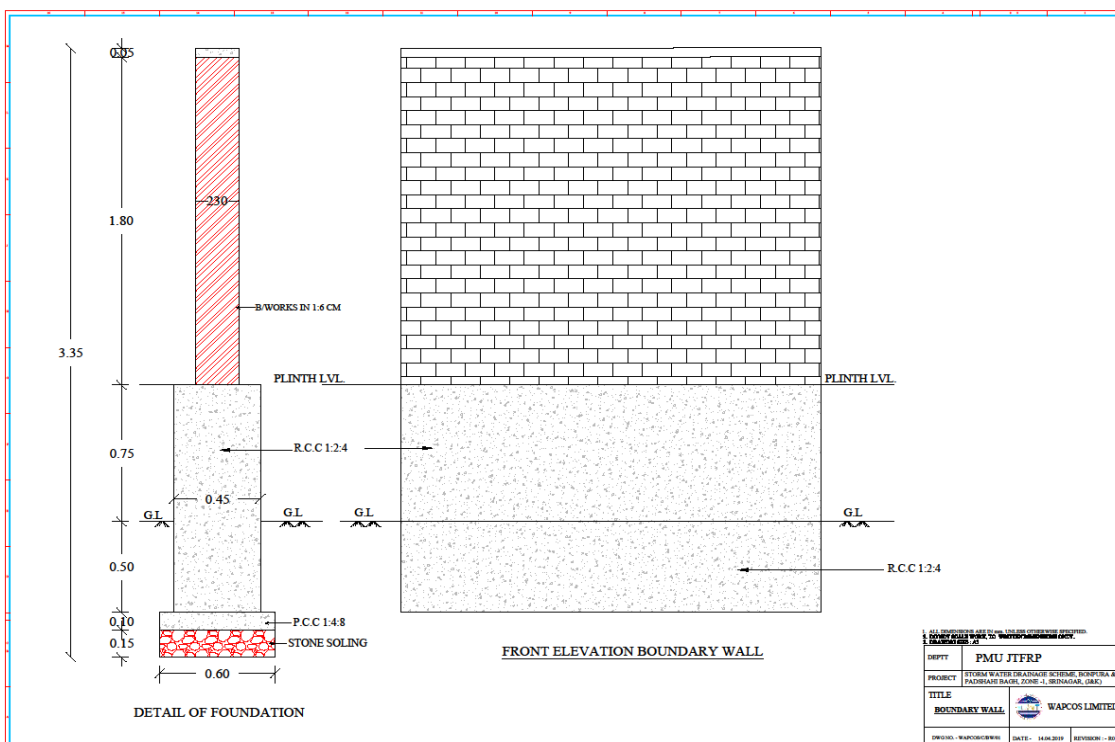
Retaining / Boundary Wall for Bonpora/ Padshahi Bagh Pumping Stations.
